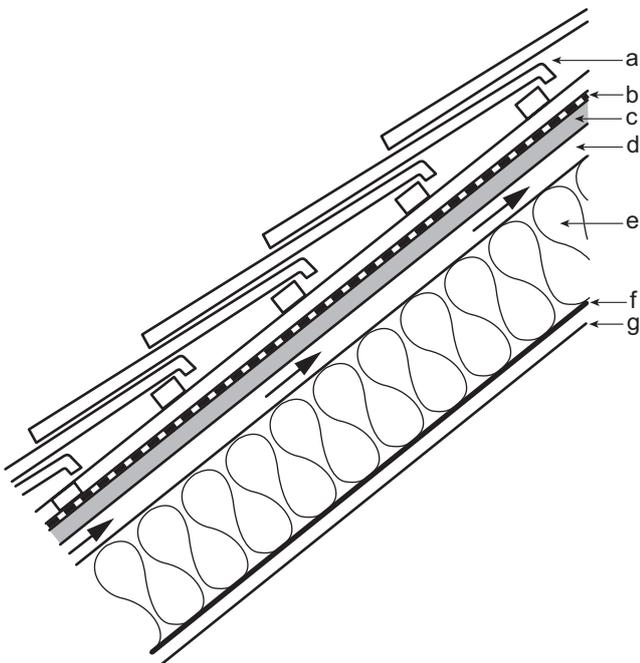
Example of a warm roof with sloping ceiling and insulation between rafters. There must be adequate ventilation above the insulation
